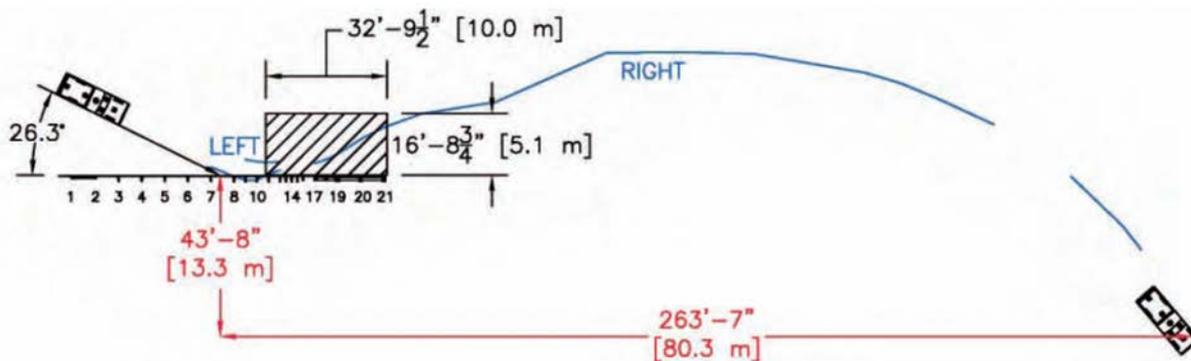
Test Impact Drawings for Test No. MWTSP-2.
